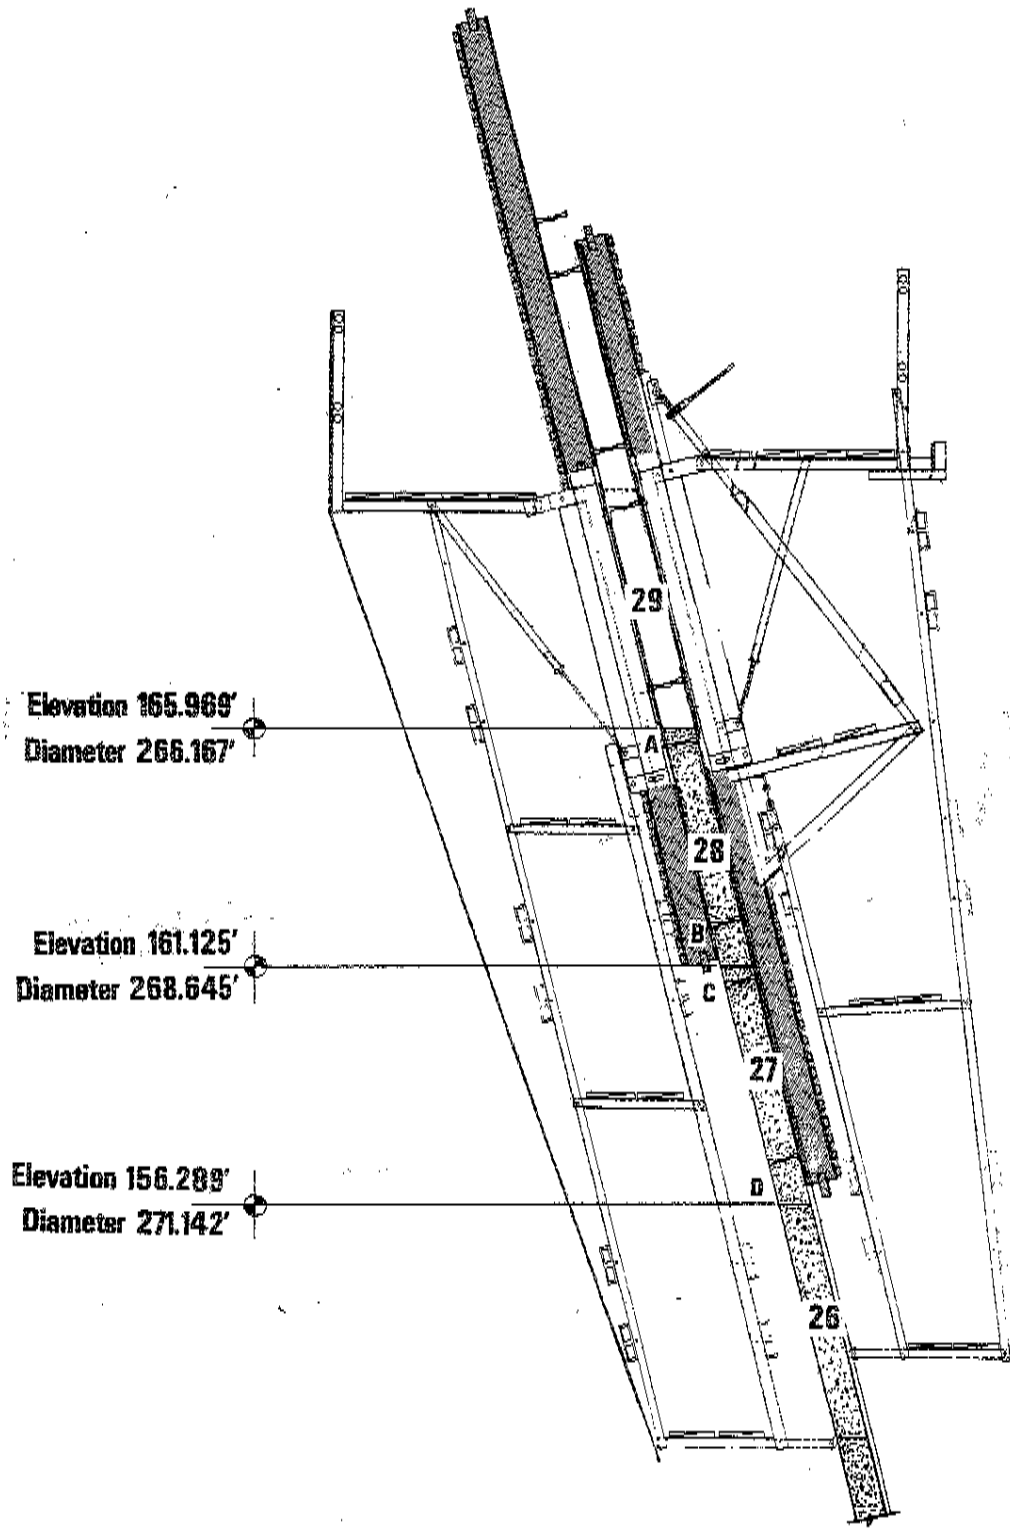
Position of Jumpform Beams Prior to Concrete Placement for Lift 29
